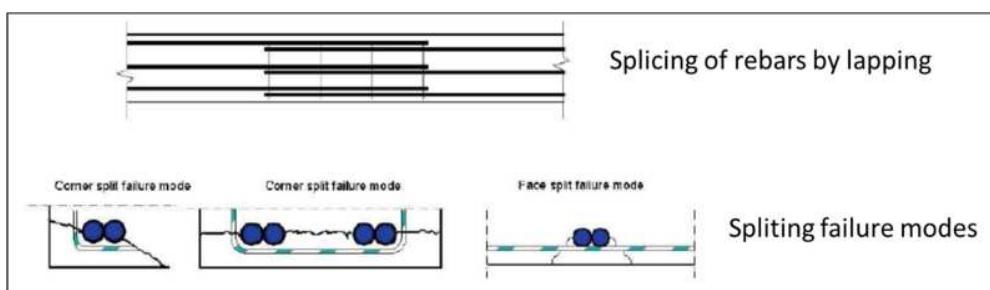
Splicing of rebars by lapping, and failure modes. From FIB (2014)
